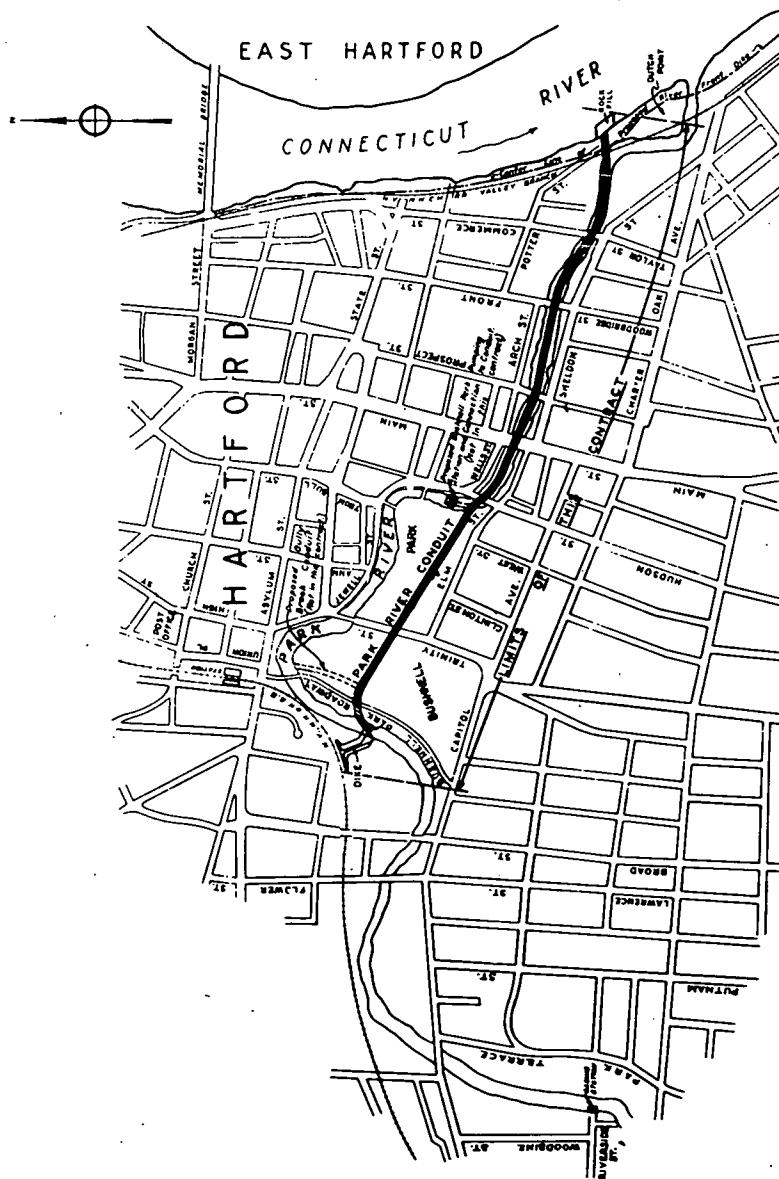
PARK RIVER CONDUIT, HARTFORD, CONN.
